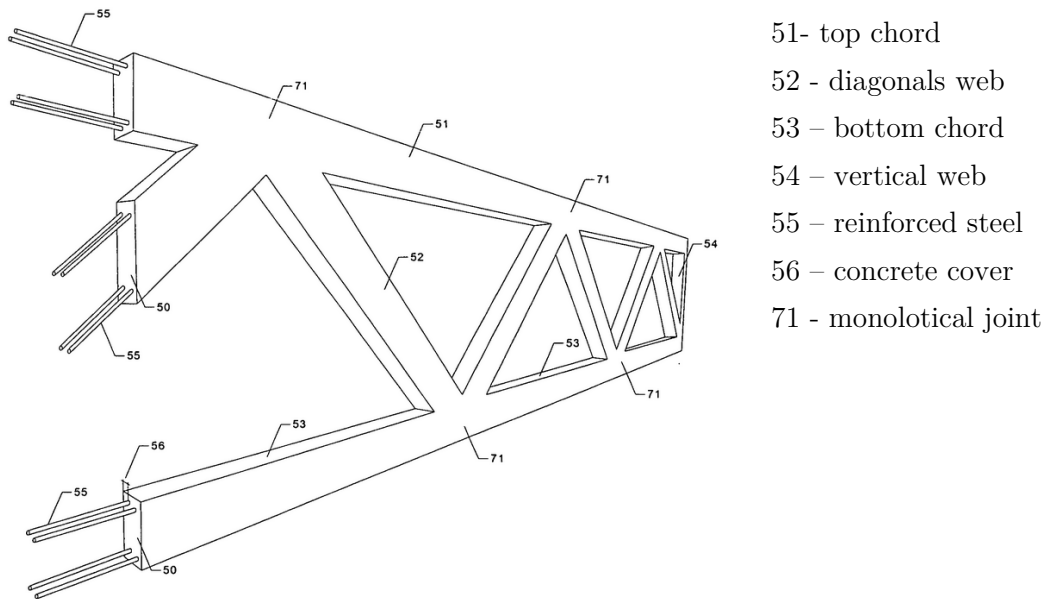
Concrete truss beam [Javier Mentado-Duran]
